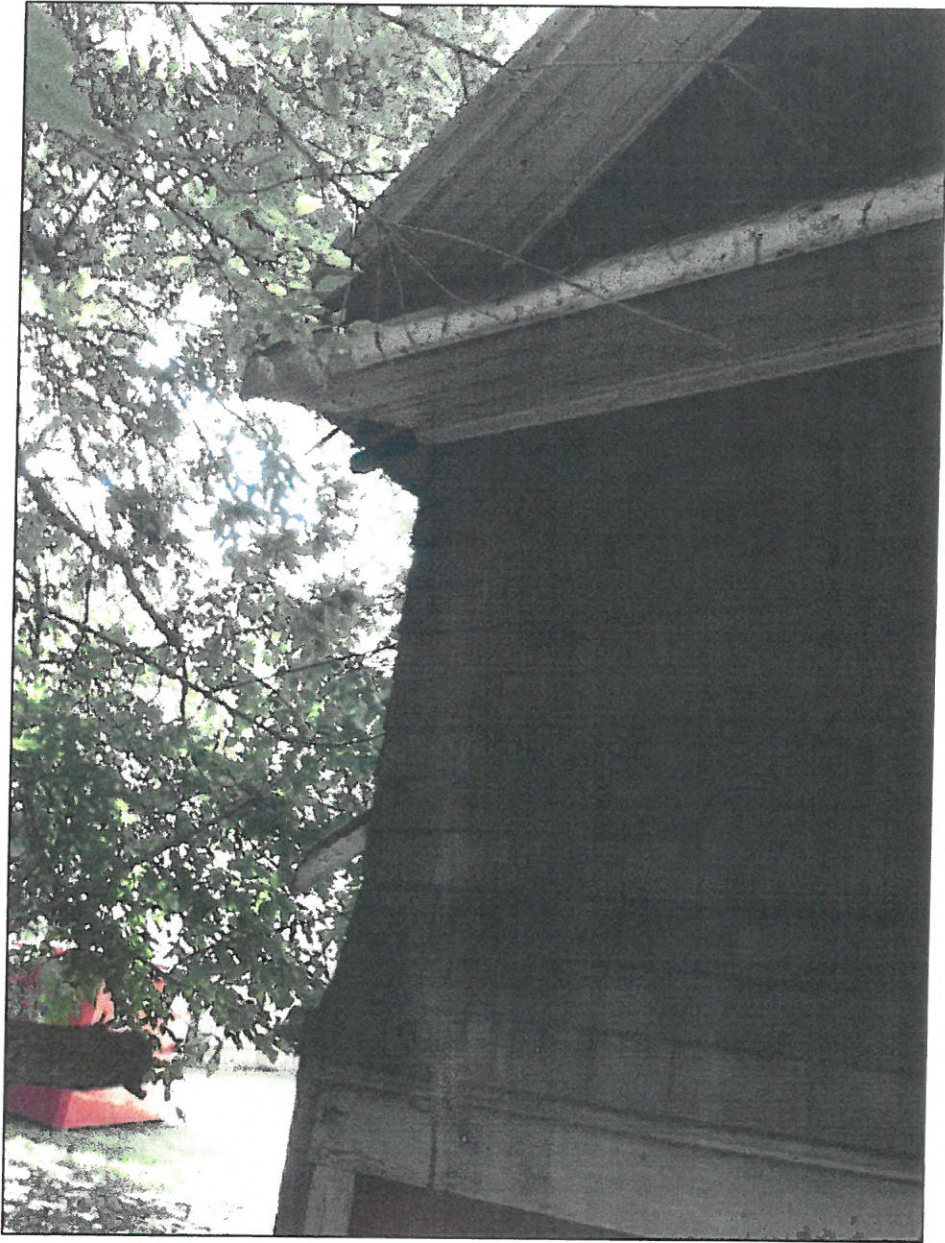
A photo of the junction of the siding and shingles at the south east corner of the building. The details of the upper gables can also be seen.
